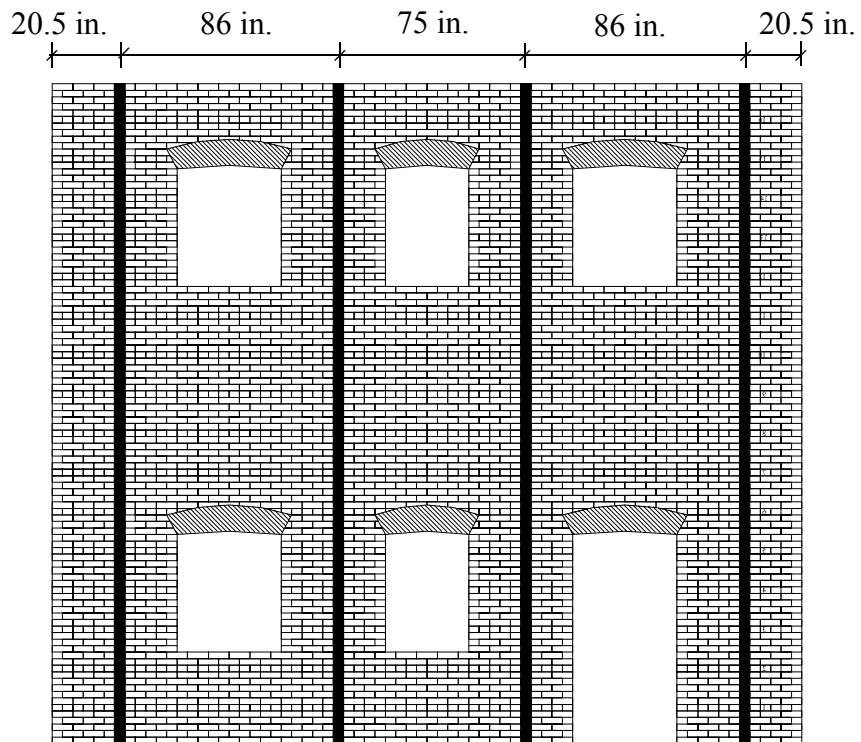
Schematic showing the location of the post-tensioning tendon in Wall A
